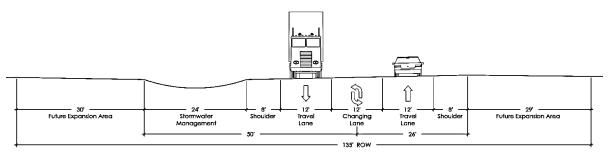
Fink Road (looking east) Near-Term Cross Section for Segment Adjacent to CLIBP
